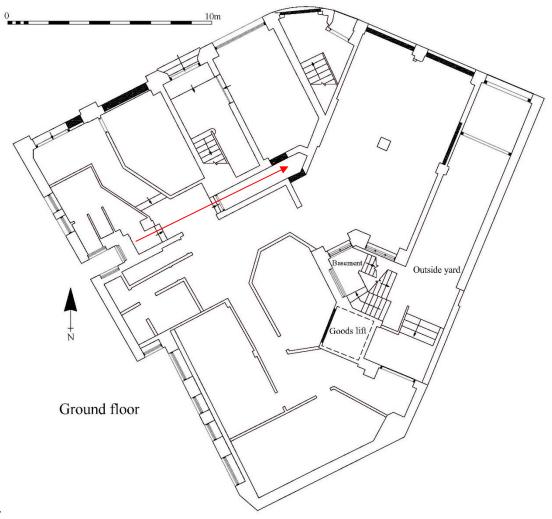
Ground floor plan Modified from drawing supplied by client. Linking corridor shown by red arrow
